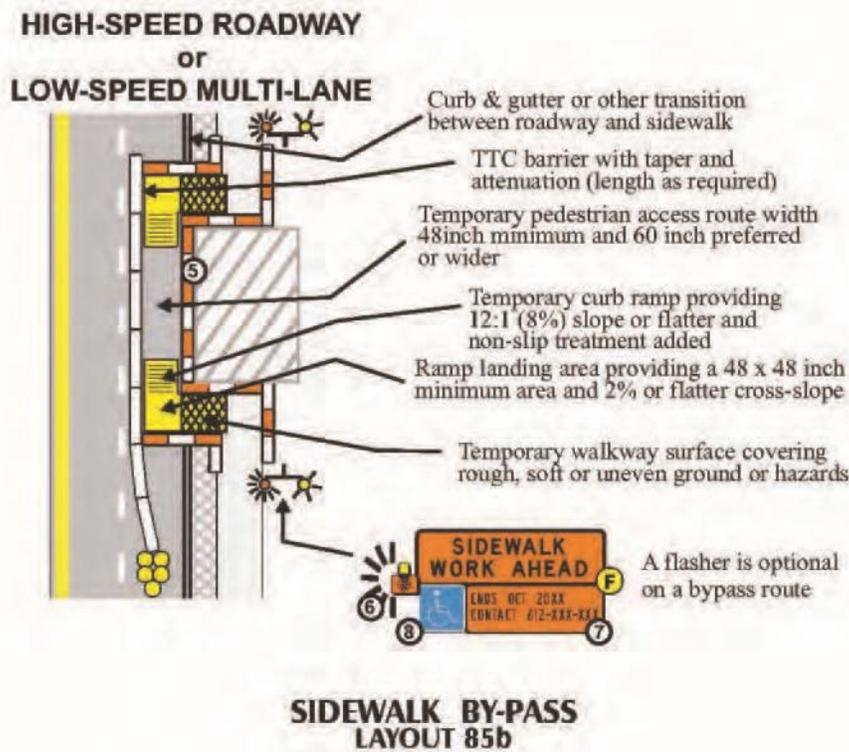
Minnesota DOT Drawing 85b: Sidewalk By-Pass on a High Speed Roadway or Low-Speed Multi-Lane Road
